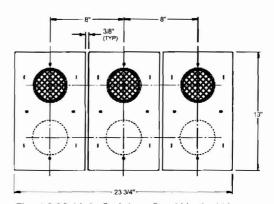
Multiple Stainless Steel Vertical Vent Kit Installation – Front View
